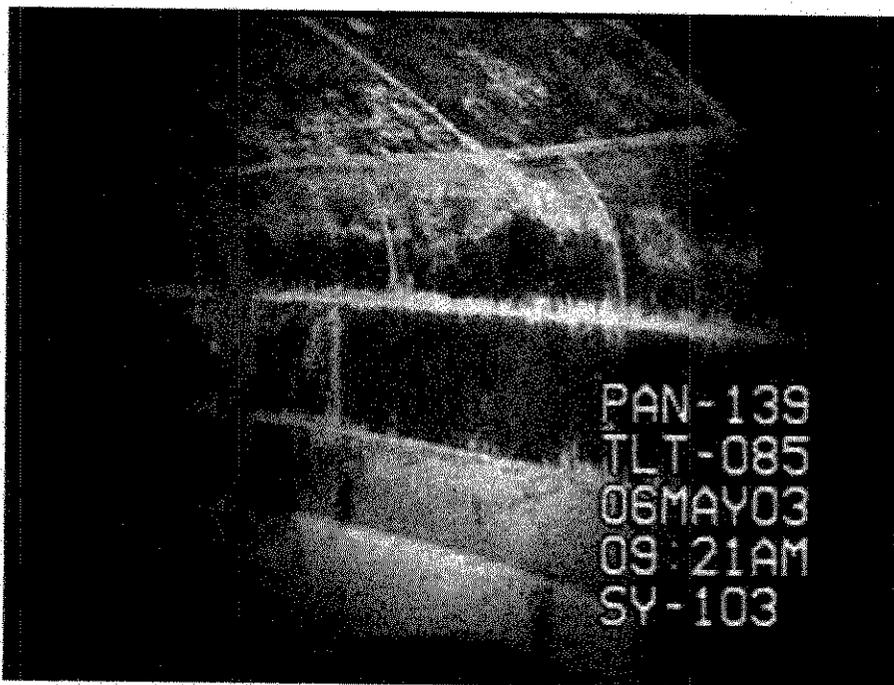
SY-103 Riser 15, Primary Tank Interior, Dome/Haunch/Tank Wall (2003)
